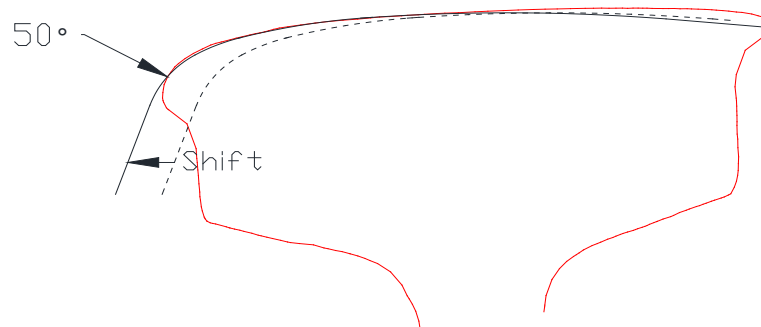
Shifting reference profile away from gauge face with reduced runoff angle to lessen metal removal.
